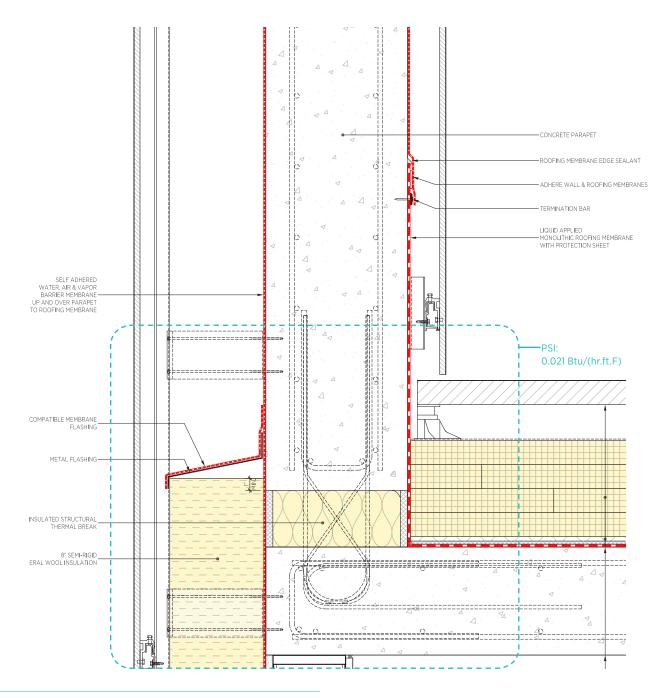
Passivhaus Proposal -Lightweight rain screen at roof parapet
